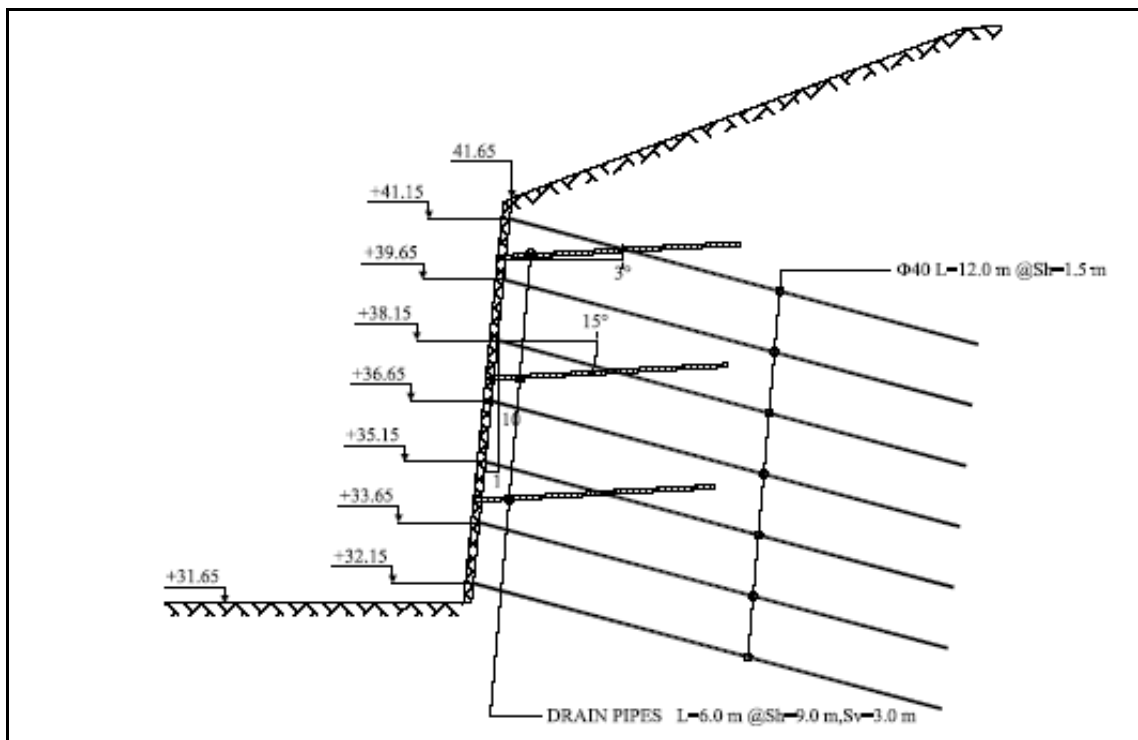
Case No. 5 – Tepe Shopping Mall, detailed cross-section of inclinometer 4
